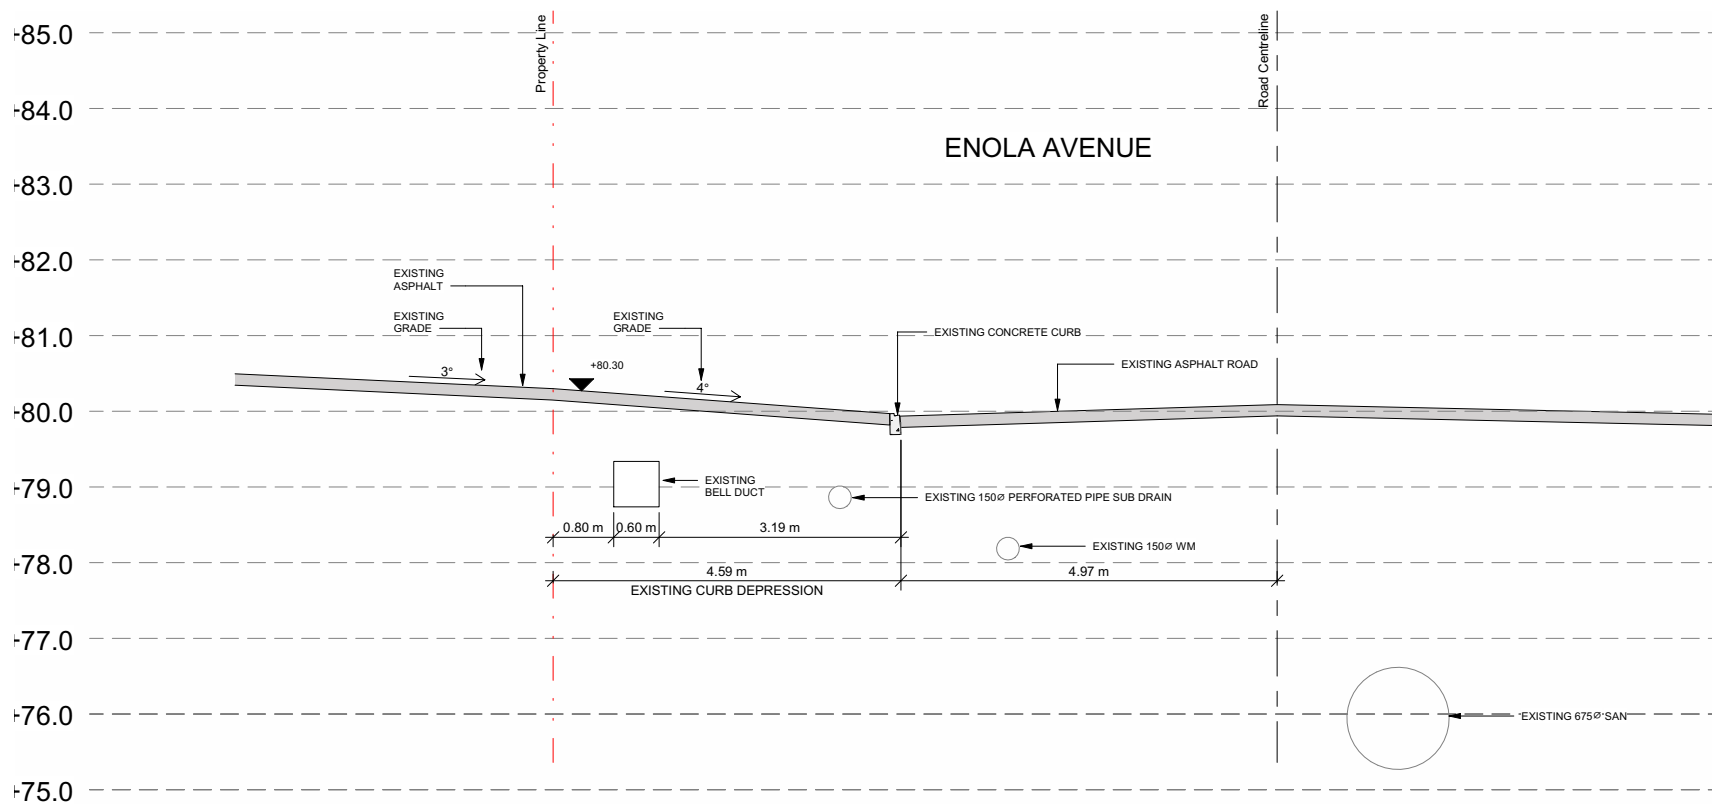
Existing Enola Avenue Typical Street Section (please see Appendix 1 for 1:50 sections)
